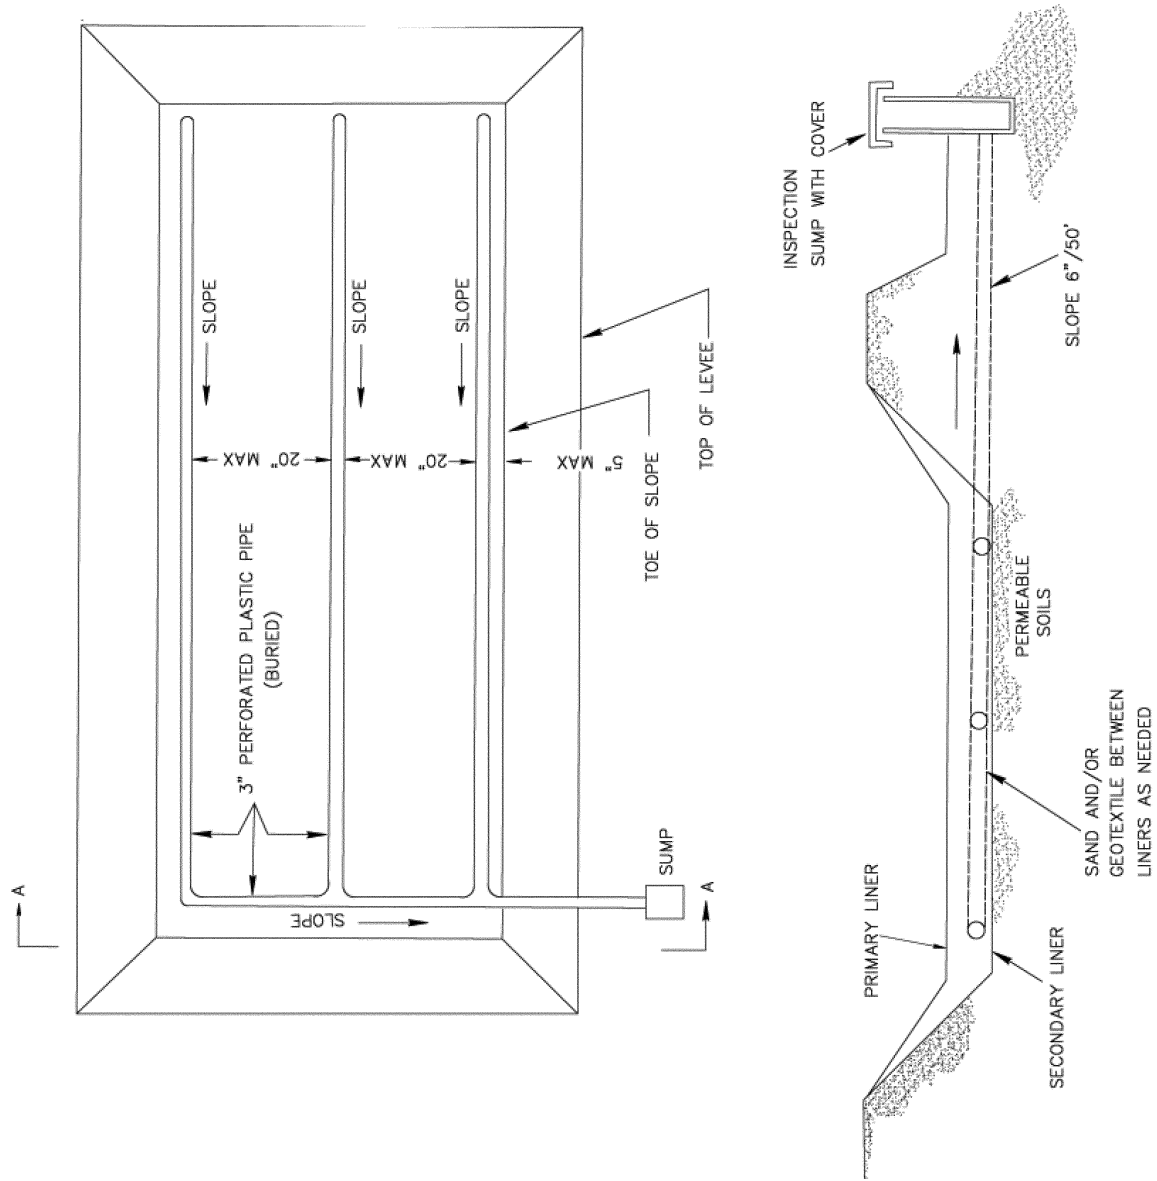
EXAMPLE OF A LEAK DETECTION SYSTEM FOR A LINED PIT CONSTRUCTED IN PERMEABLE SOILS.
